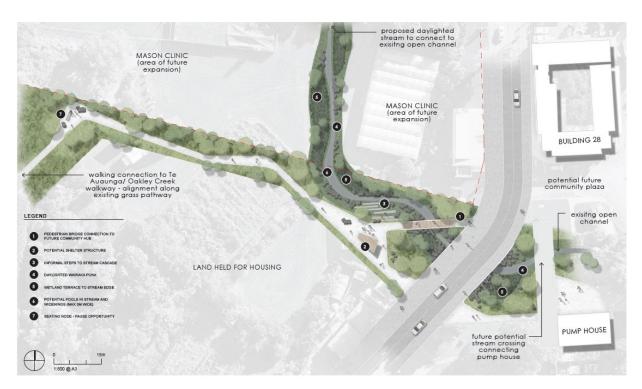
Landscape Plan for stream daylighting, showing walking path connection. Source: LUC60373078 approved plans, page 10.
